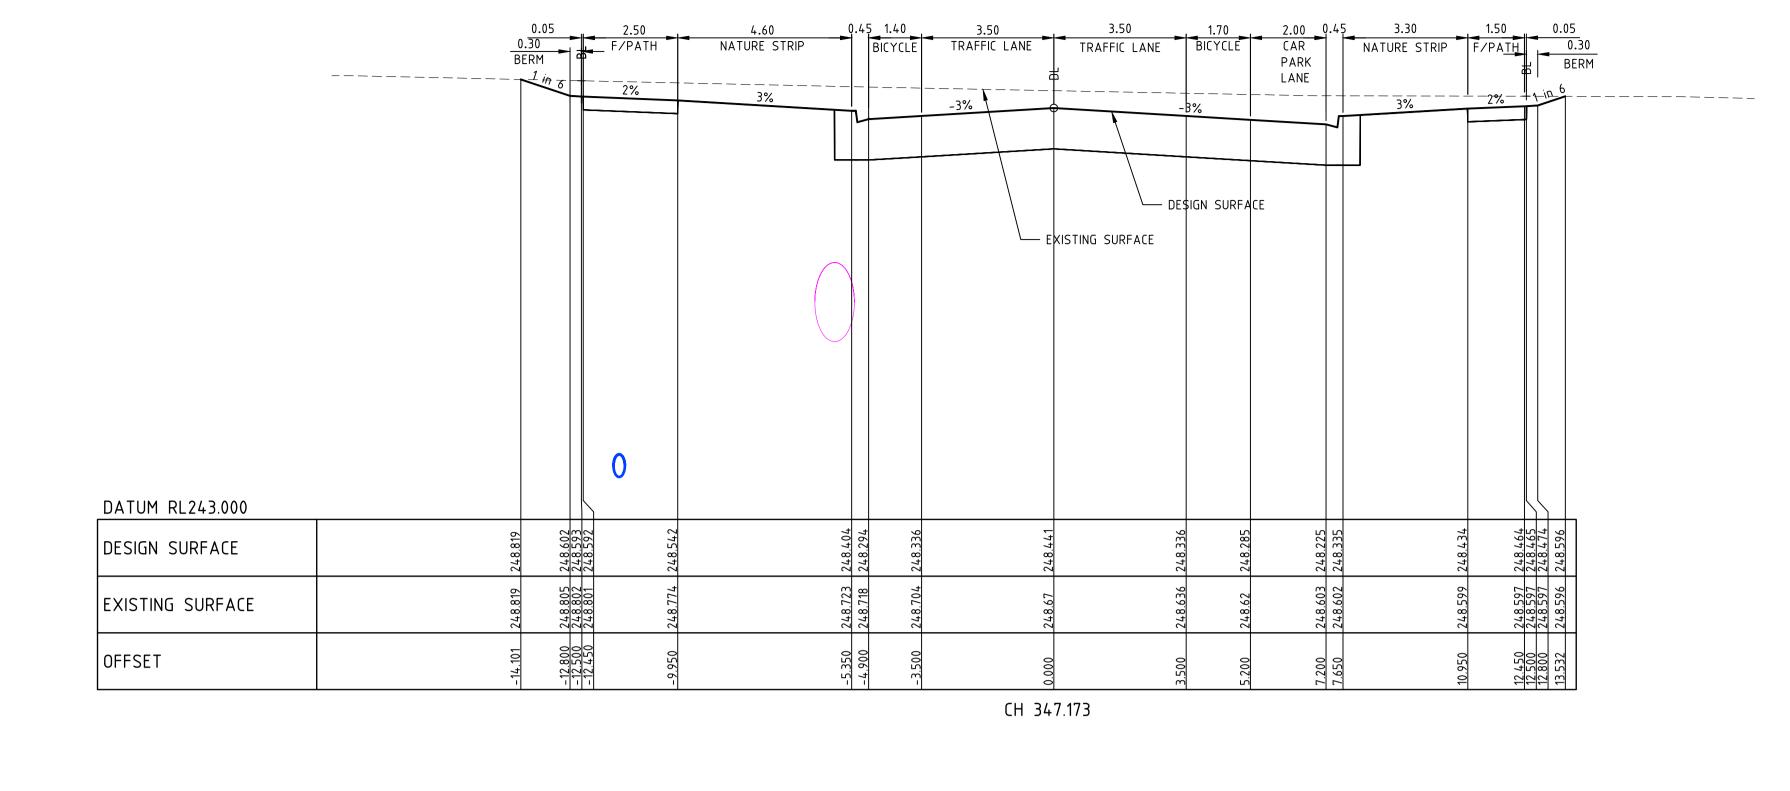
LS04 Rev 1 Hor 1:500 0m 5m 10m 20m 30m Sheet No. 15 AS CONSTRUCTED 3m © Dalton Consulting Engineers Pty Ltd
